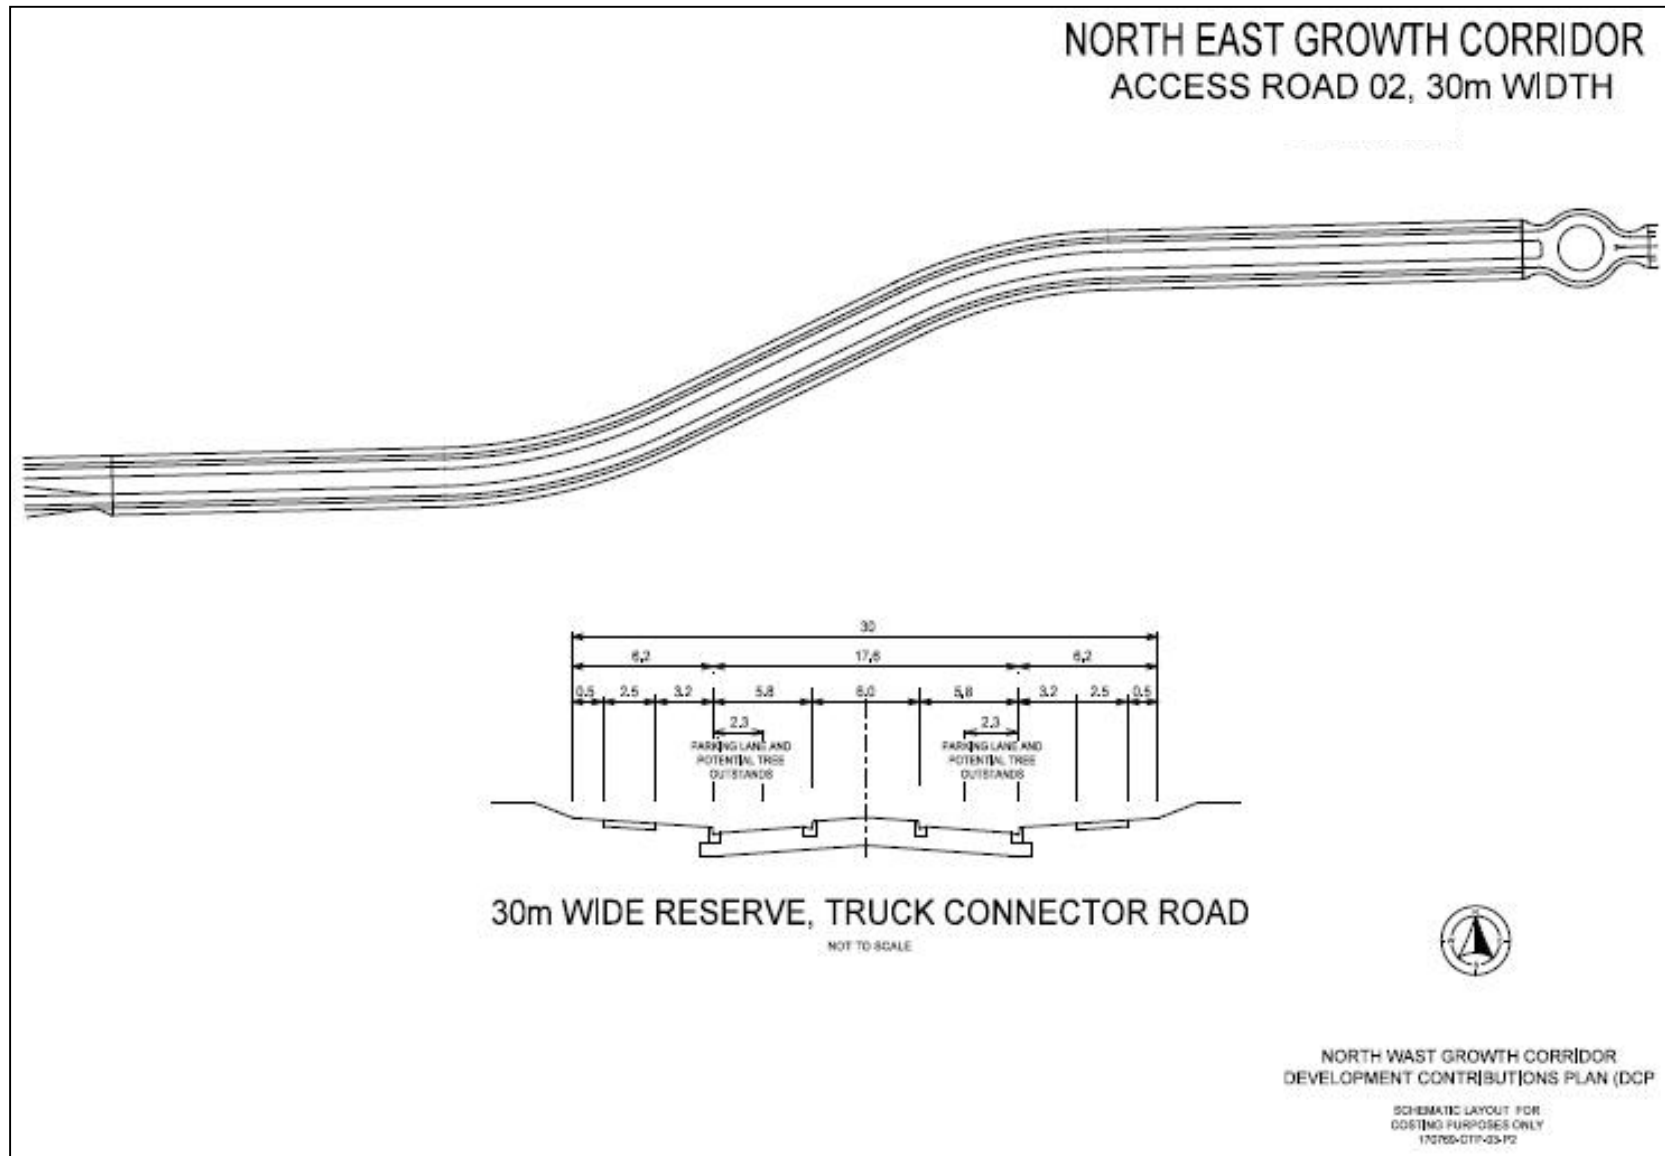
Typical Road Profile for Road-02 – Trunk Collector full length from Verney Road to roundabout
